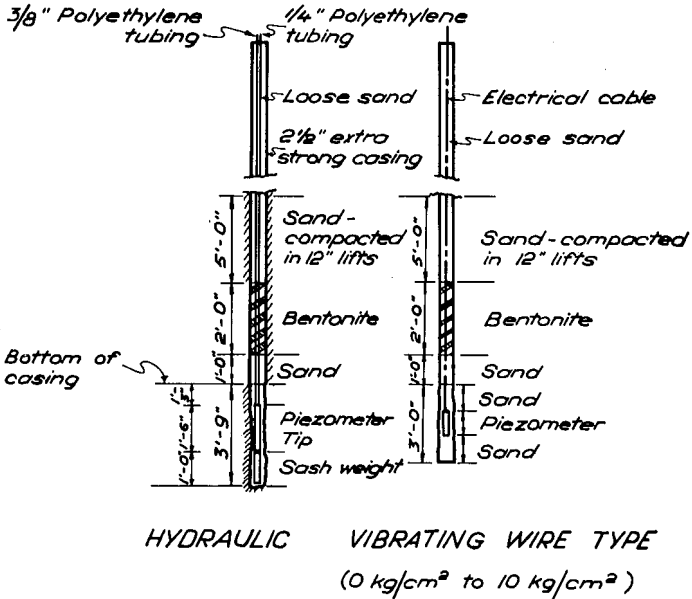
Details of Hydraulic and Vibrating Wire Piezometers
